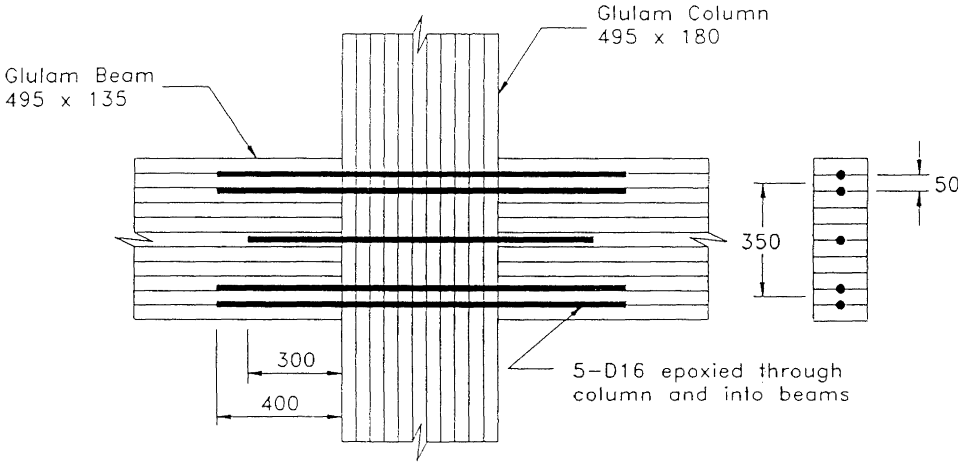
Arrangement of epoxyed steel bars in ductile beam-column connection.
